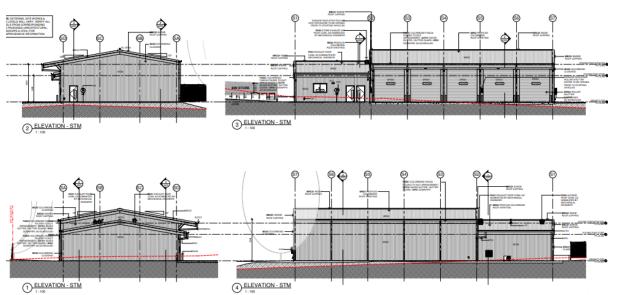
Stores Elevations NBRS & Partners 28 September 2023
